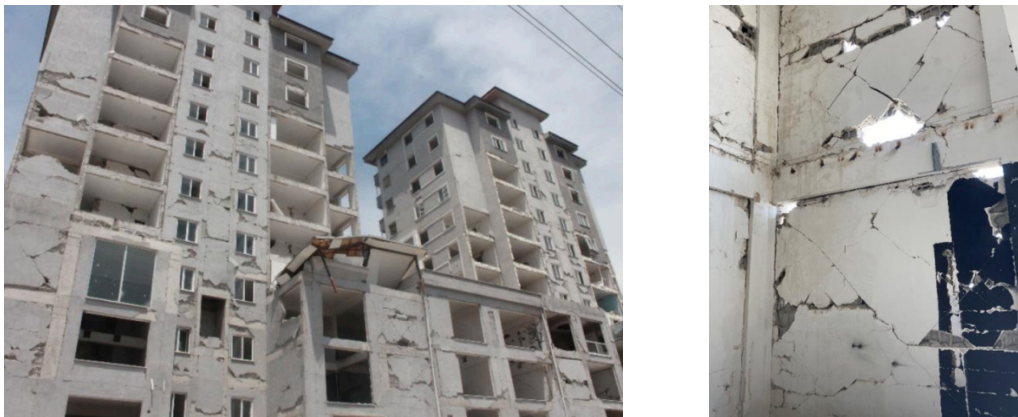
Failure of exterior masonry infills due to extensive cracking and separation from the frame (Brzev et al., 2025)
